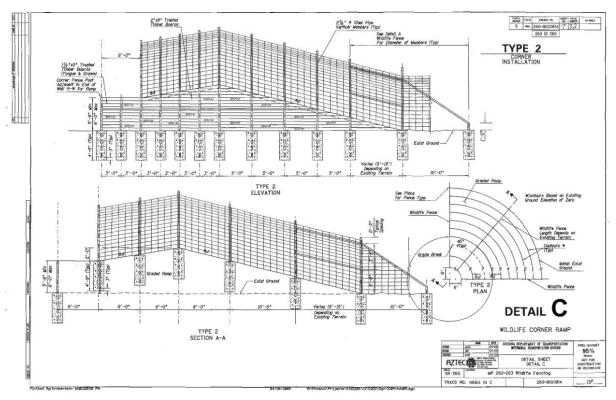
Arizona DOT Wildlife Escape Ramp Fencing
